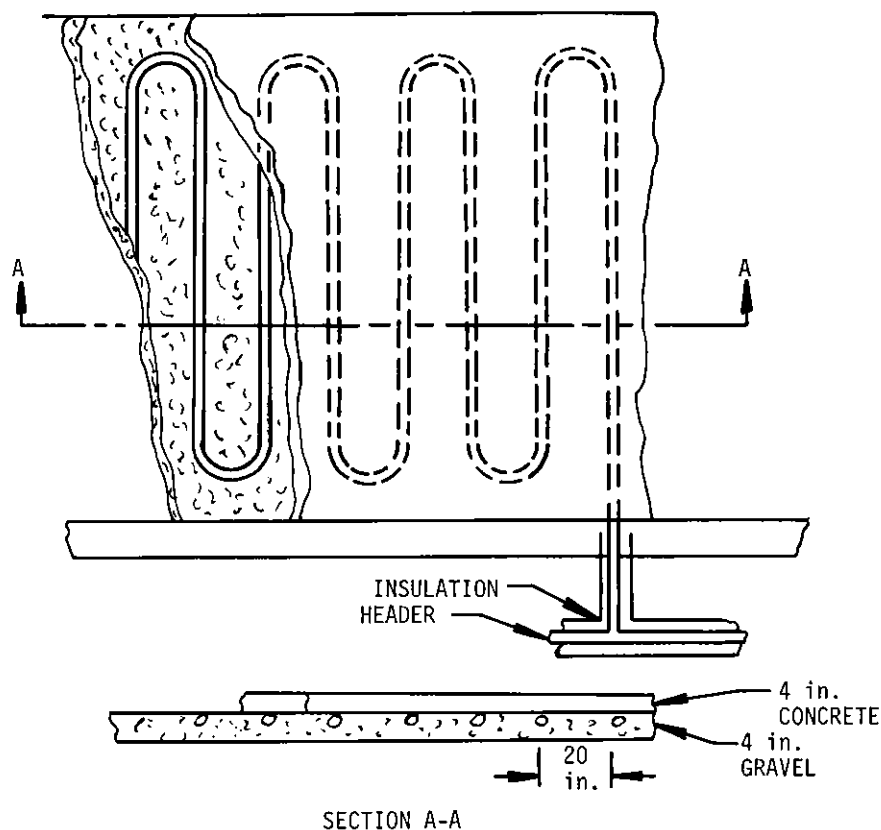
Snow-Melting Pipe Arrangement in Sidewalk.
